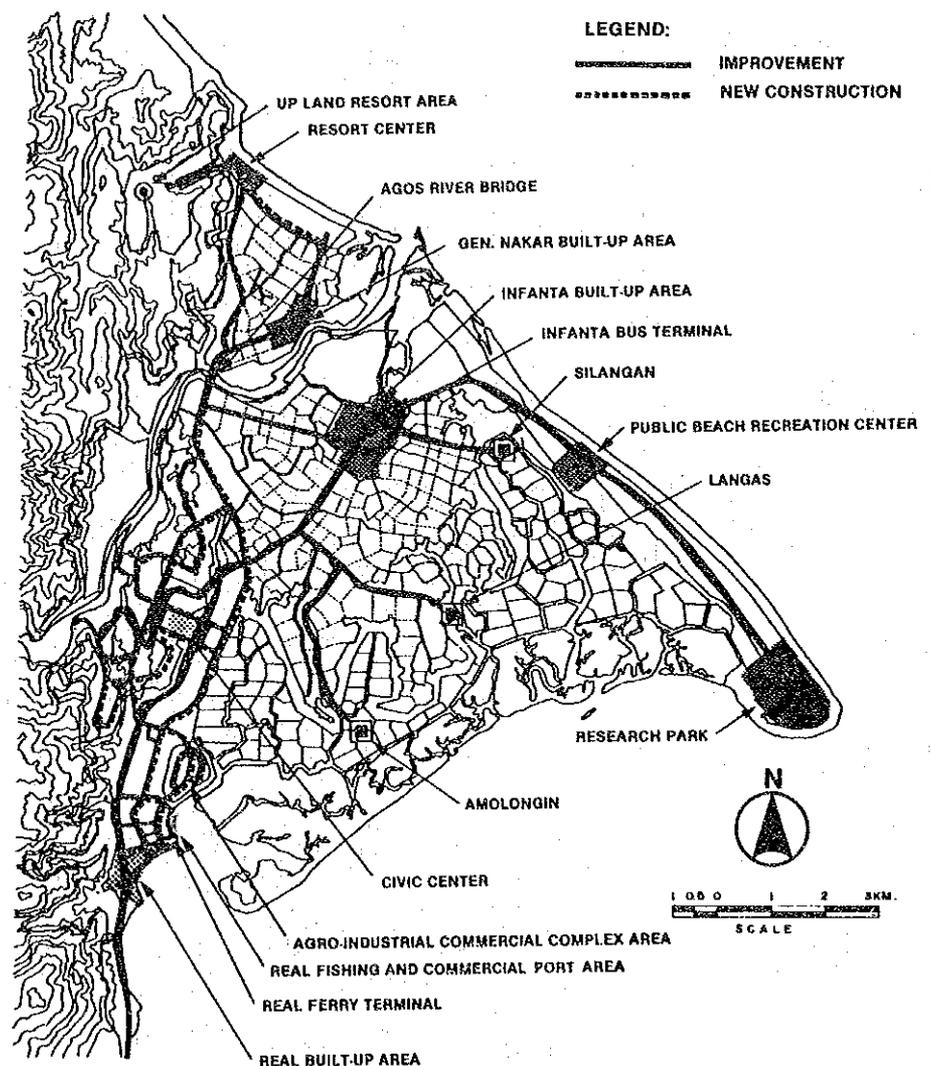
ROAD NETWORK PLAN OF IRM
